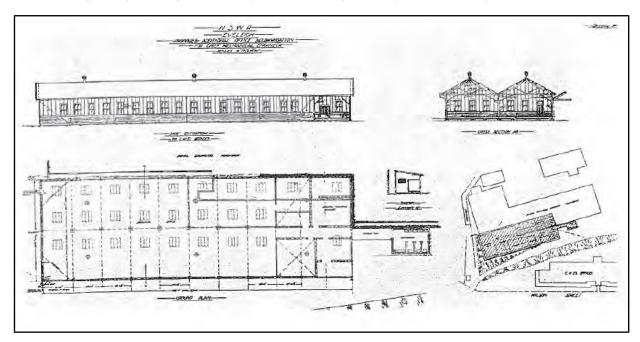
Plans, sections and elevations of the 1923 additional Drawing Office located southeast of the CME Building (Source: RSA Archives B2 Plan room in Transport House. Located by David Sheedy- Architect and Victor Poljanski -SRA Archives Manager)
